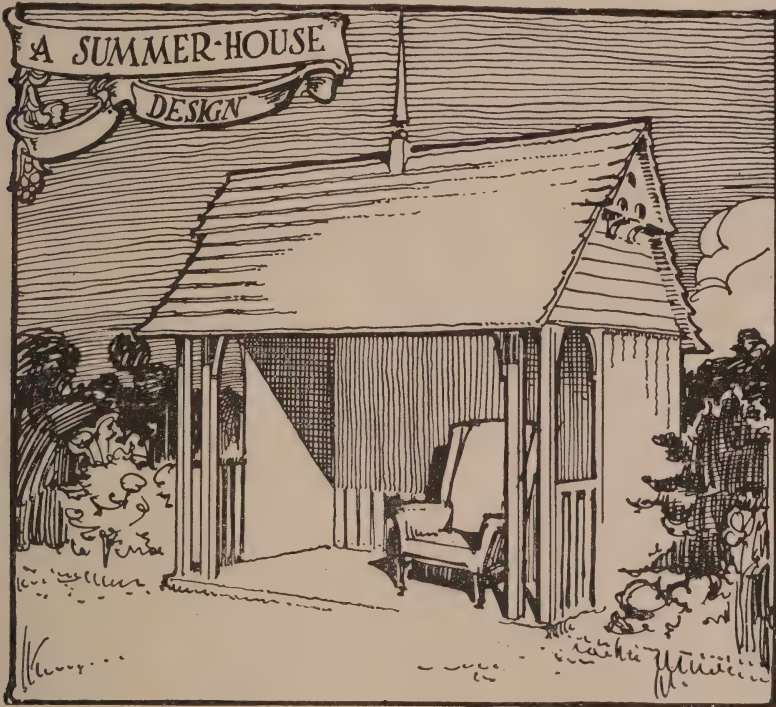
Gable-roof Summerhouse with Pigeon Cote
